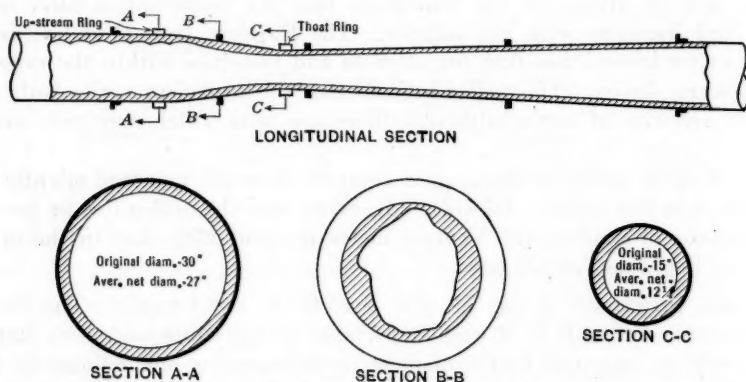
VENTURI METER SECTIONS, SALEM, MASS., SEWAGE PUMPING STATION.
